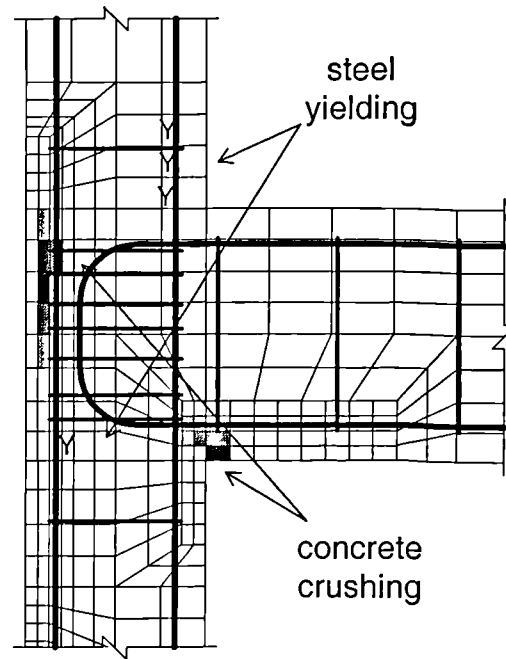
Approaching column flexural failure - BCC2
